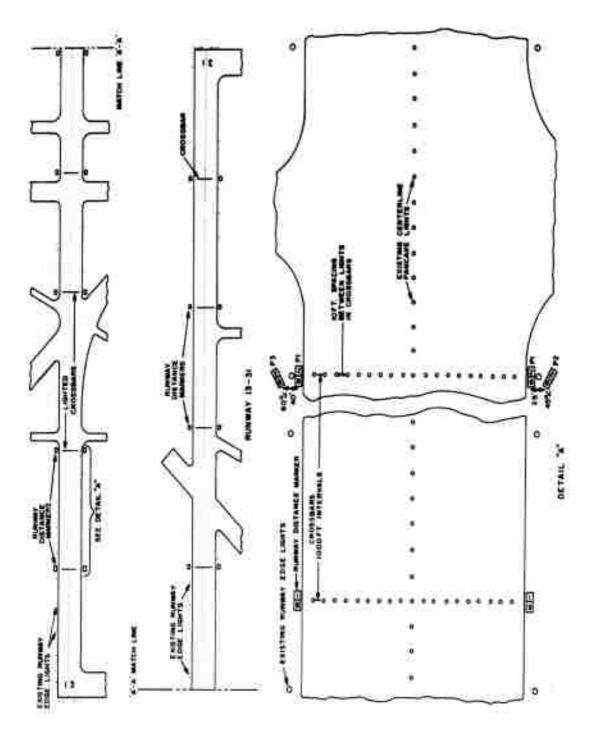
EQUIPMENT LAYOUT OF CROSSBARS AND DISTANCE MARKERS RUNWAY 13-31
